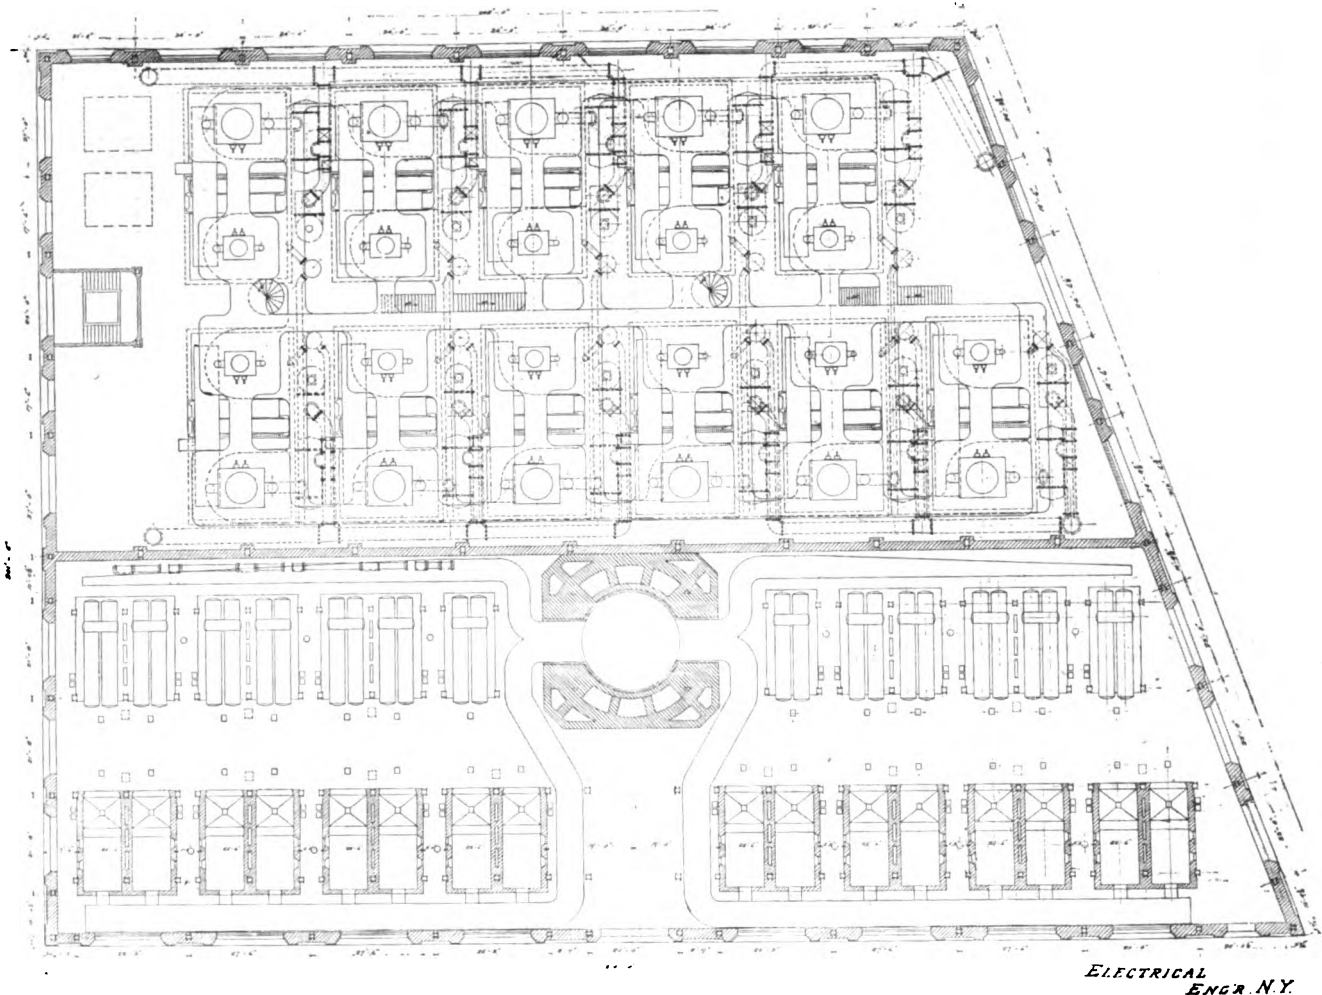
70,000 H. P. CENTRAL POWER STATION OF THE METROPOLITAN STREET RAILWAY CO., NEW YORK.—PLAN.
